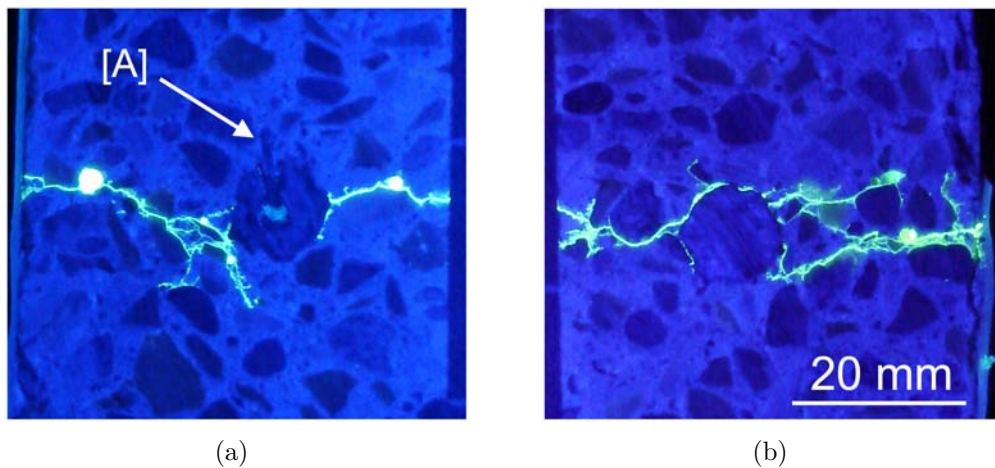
Transverse sections from the (a) instrumented rebar and (b) standard rebar. Sections were located ~ 5 mm from primary crack. [A] indicates the location of a sensor. (Author's photos)
